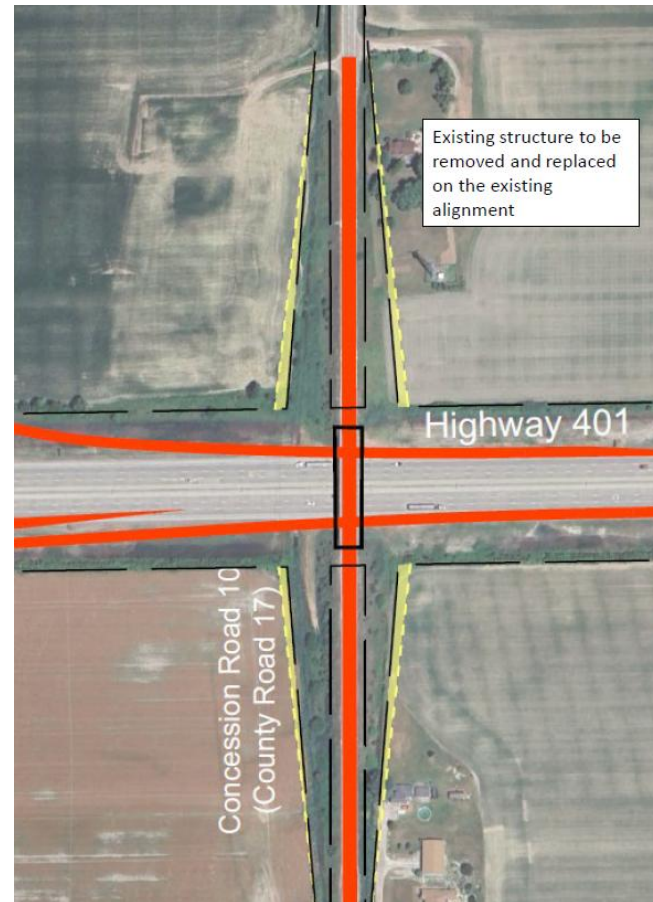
Alternative 1 – Replace on existing Alignment Bridge closed with detour
